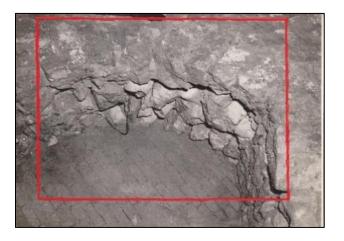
detail of photo 2, area edged red, looking up under stone arch, shows roughly finished surface, and metal tie
